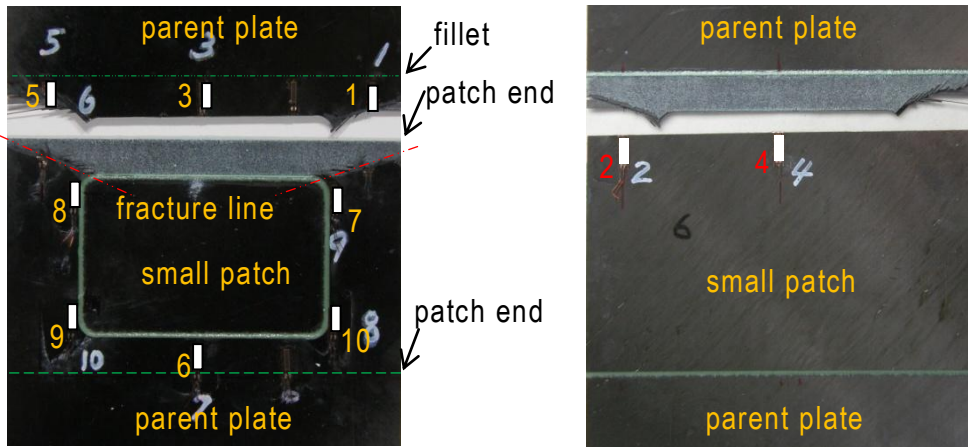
Fractured specimen and positions of strain gauge of CFRP small-PP-2
